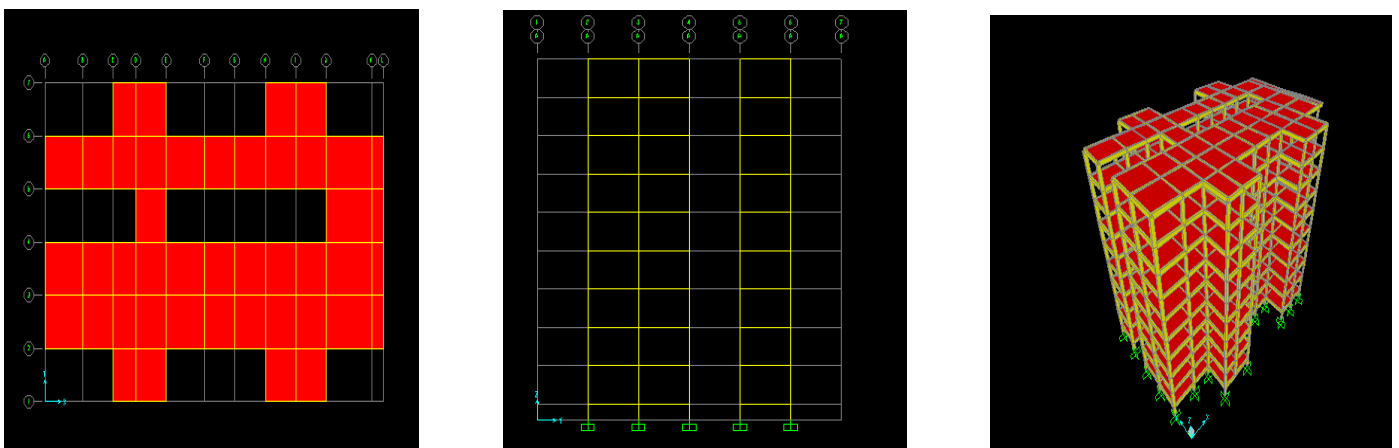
Plan, Elevation and 3 D View (MODEL 4)
